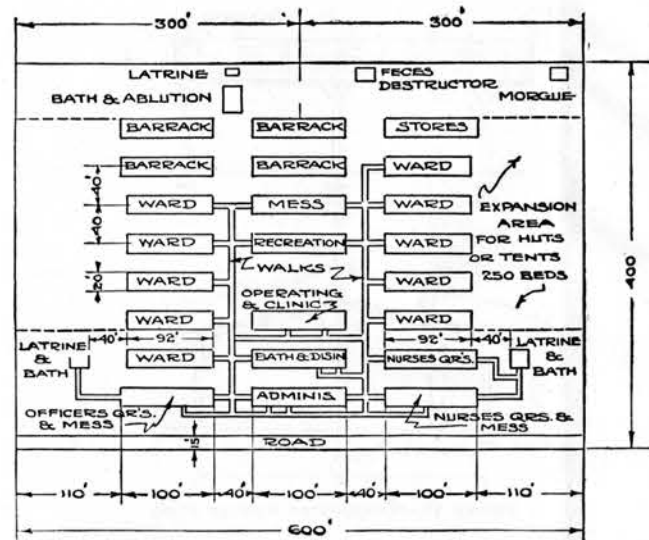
Typical lay-out for 250-bed station hospital.
